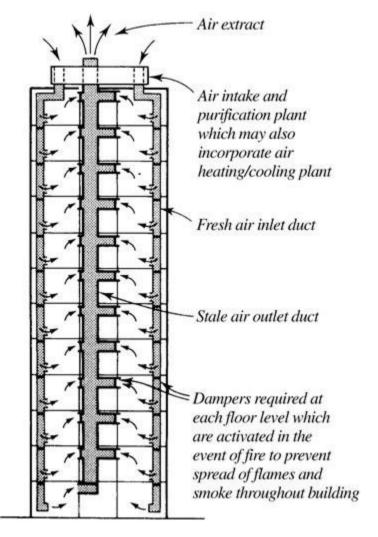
Artificial ventilation provides clean air uniformly throughout a building.
